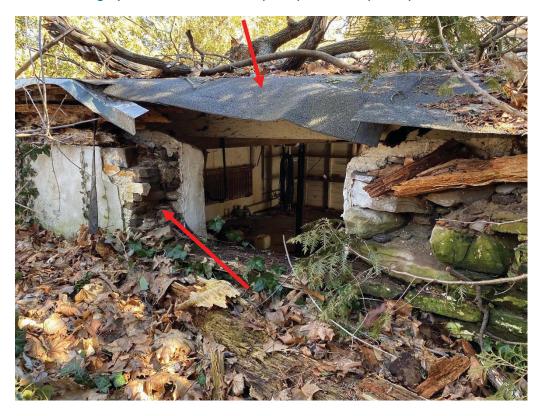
Garage Front Elevation - Deteriorated Building Envelope and Boarded Up Doors
